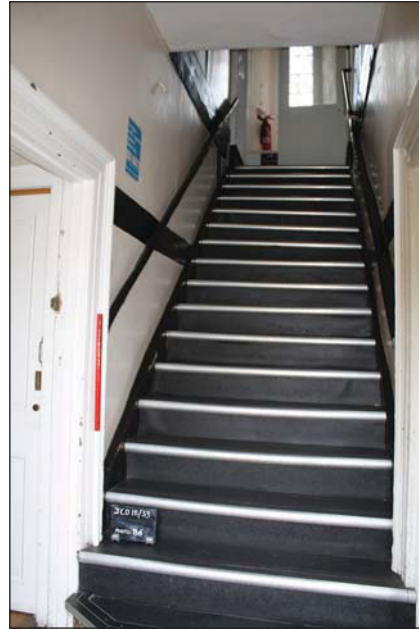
Room 2, oblique of stairs showing timber framing, looking South, Scales: 1m.
